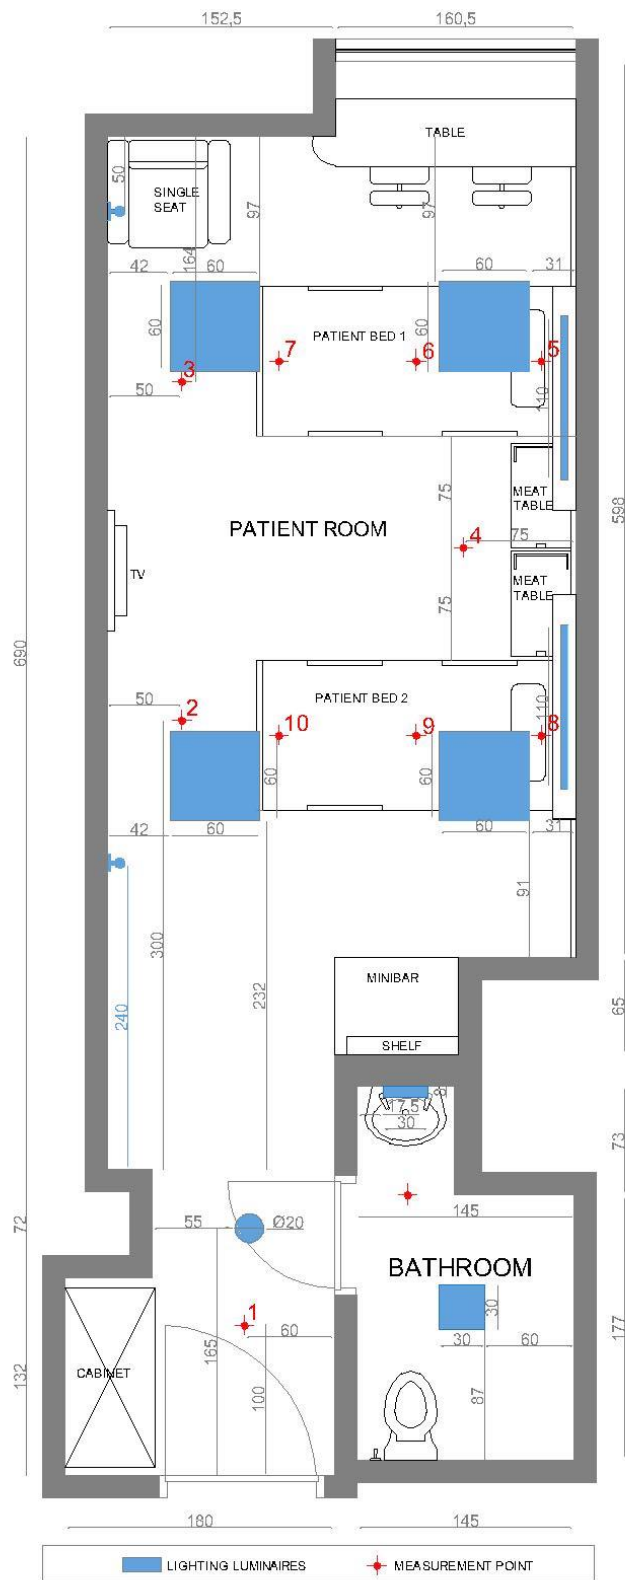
Private Tınaztepe Hospital-Room Plan
